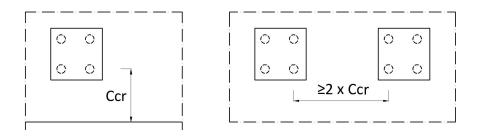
The edge distance c_{cr} of EFPR fastening plate from the edge of the concrete structure and the center distance between adjacent fastening plates.
